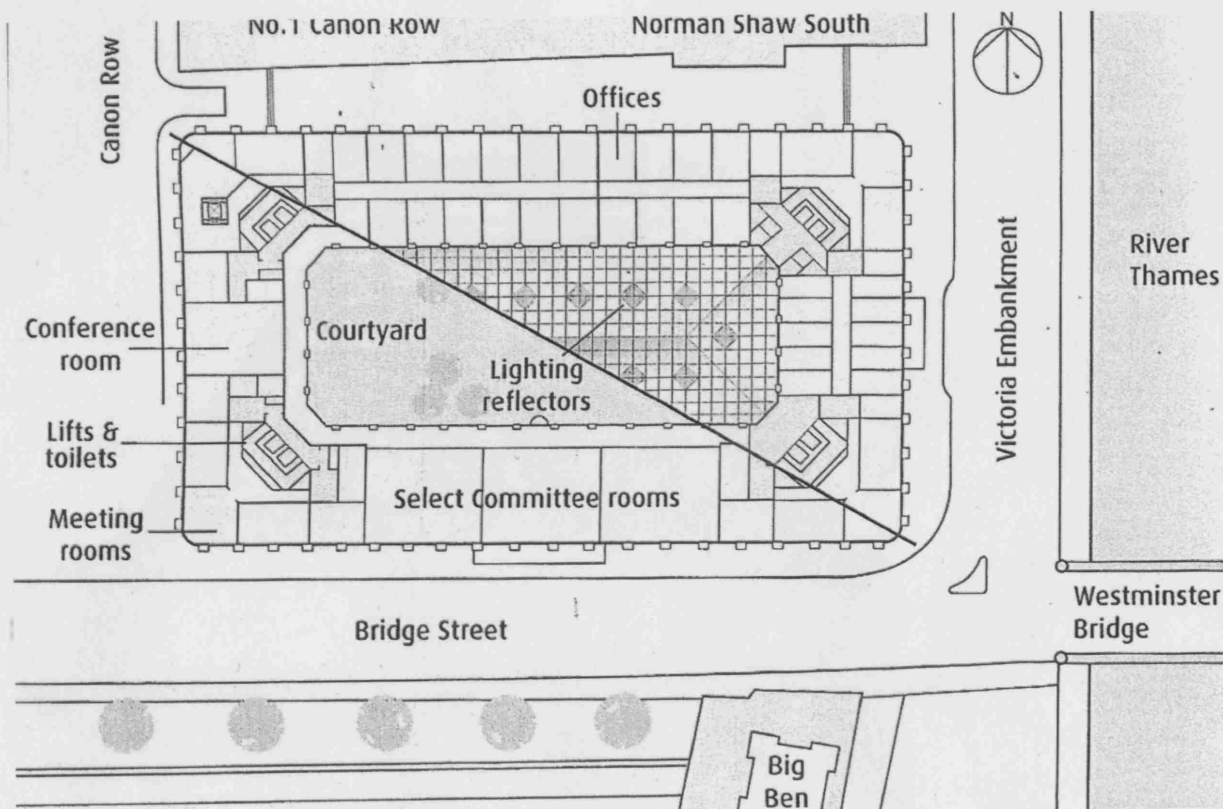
Site plan and floor plan showing half the ground floor and half the upper floors for Portcullis House (Source: Bunn, 2000 pp.25)
